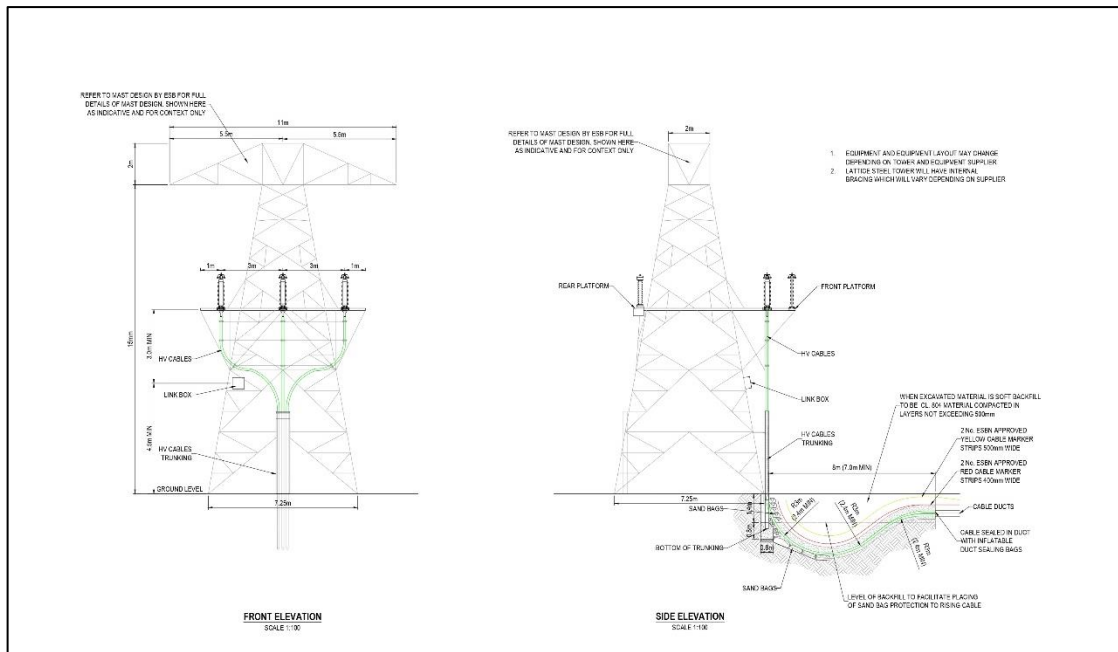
Typical Mast Detail (CSEA Sheet:1530)
